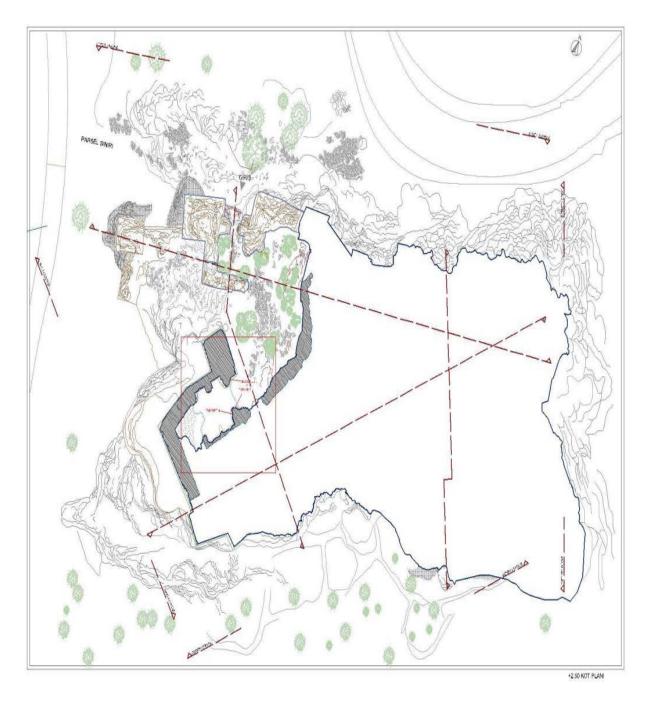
Plan View of the Places Taken at the Bottom Floor + 2,00
